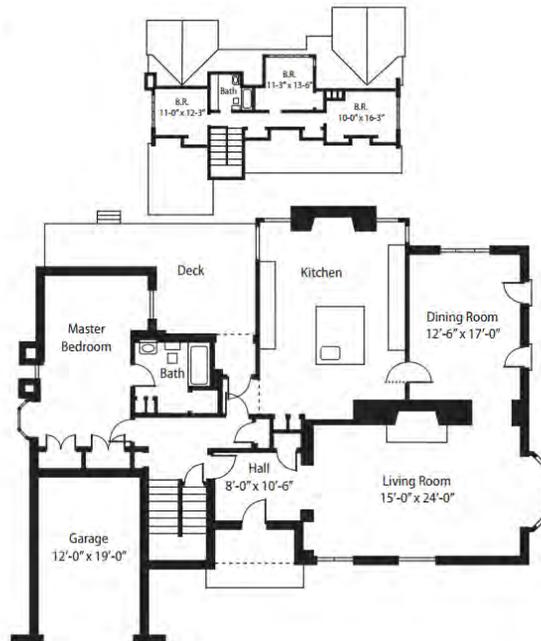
of 40. Floor plan #2. Ross Hame's present floorplan.
